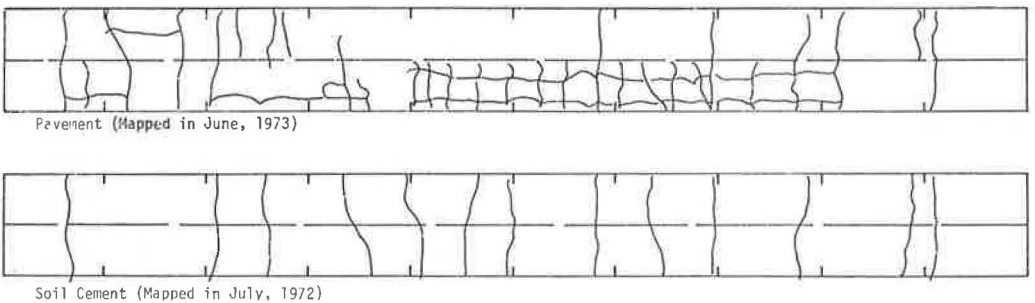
Cracking pattern of soil-cement base and superimposed pavement for experimental section with Type II cement (same as control section).
